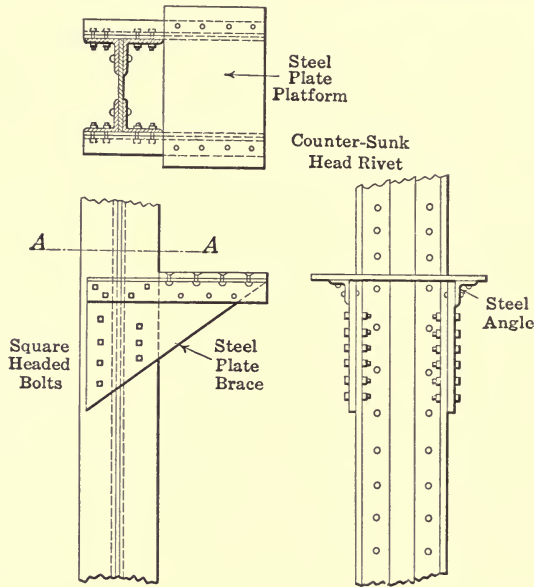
STRUCTURAL STEEL MOTOR BRACKET AND COLUMN.
